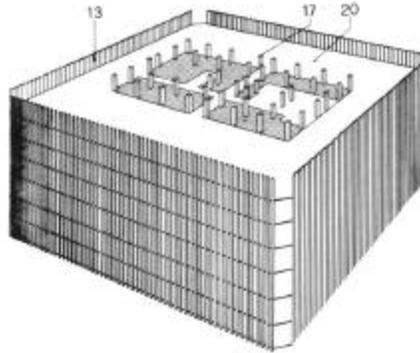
Double hollow tubes structures of the World Trade Center showing exterior columns (13), floors (20) and core columns (17)
